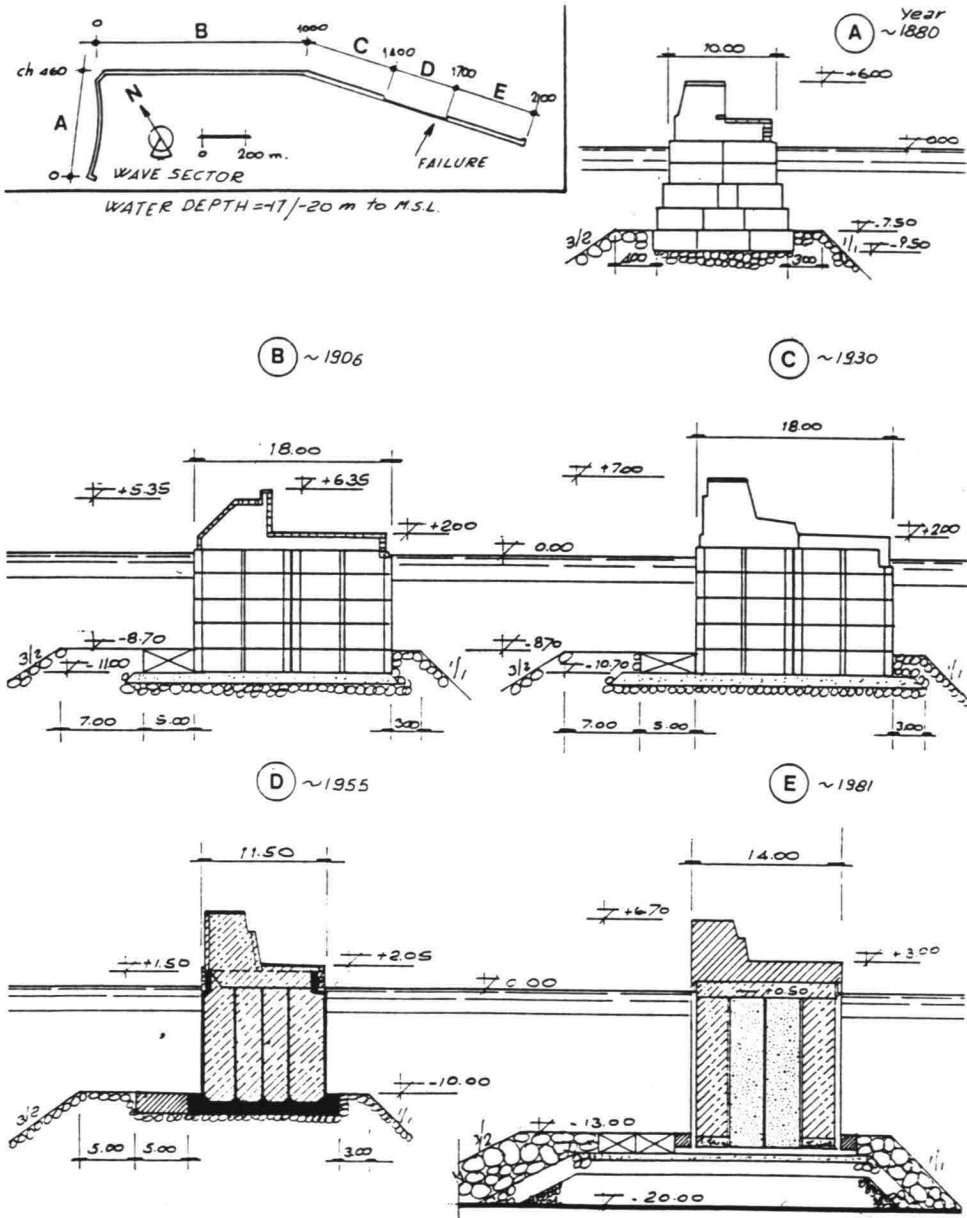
Plan and sections of Duca d'Aosta breakwater in Naples
